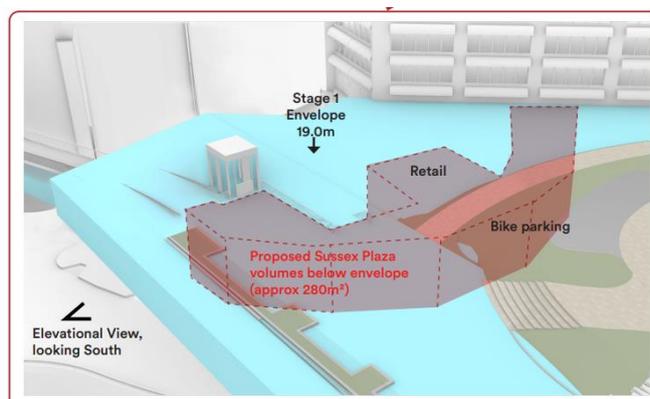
Detailed elements of the Sussex Plaza retail space (as part of the concurrent Stage 2 application) that require modifications to the approved envelope
